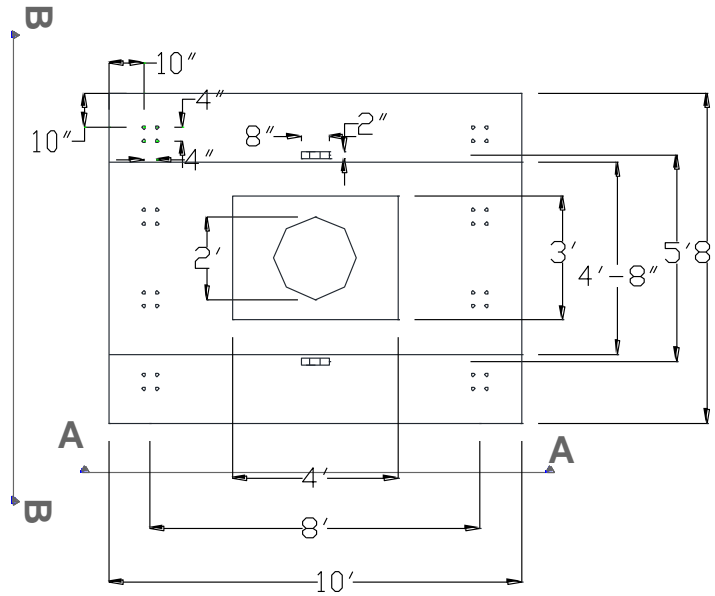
Plan view of slab reinforcement for Specimen #2
